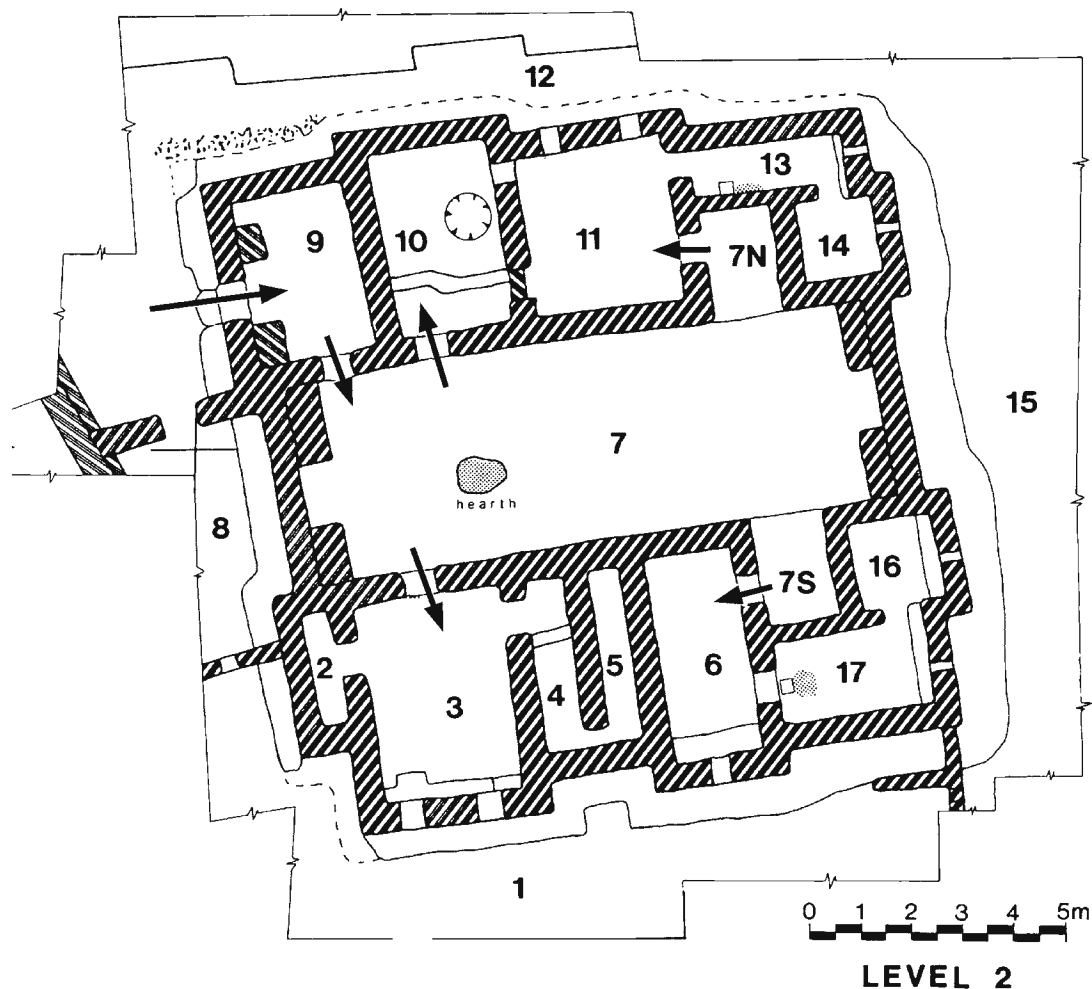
Plan of the burnt house at Madhhur. Arrows mark the doorway from outside and access routes from the central hall to other parts of the house (after Roaf 1989: fig. 1)
